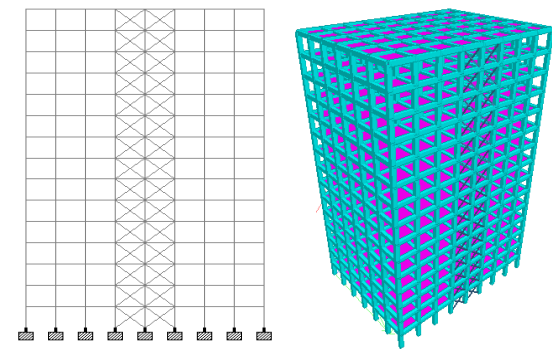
Framed building with Bracing at the exterior side along z-direction.
